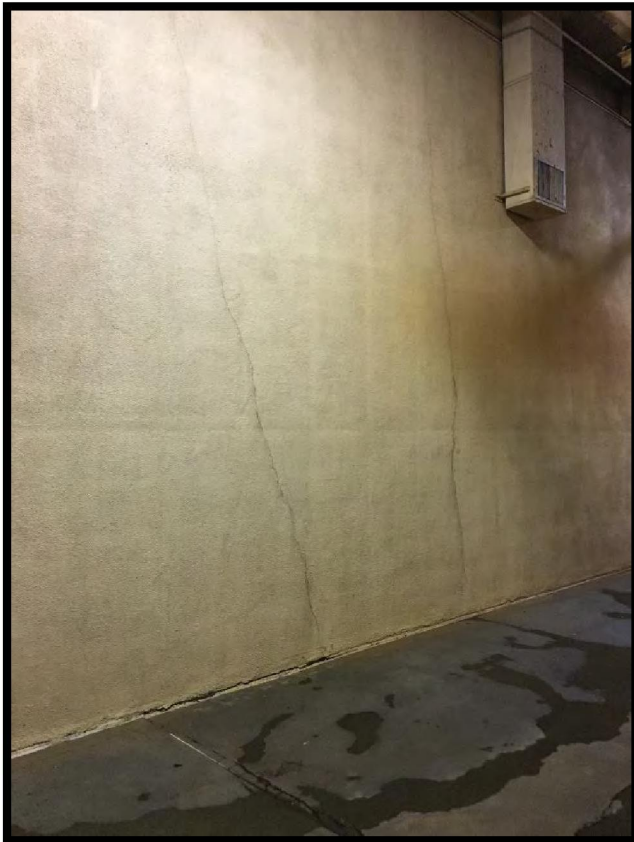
, Aerobic Digester Stairway, Rebar erosion in concrete
